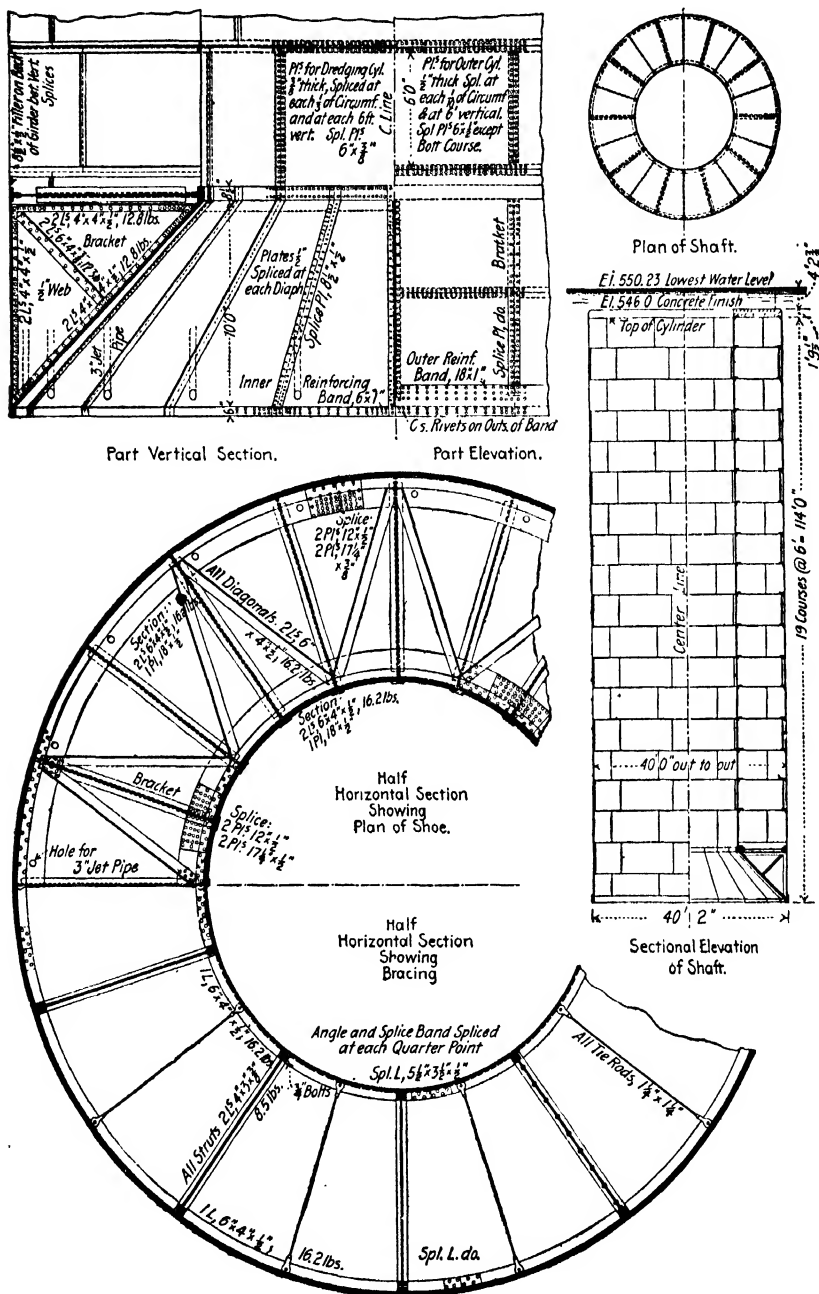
Details of Open Caisson for Pivot Pier of Omaha Interstate Bridge.
